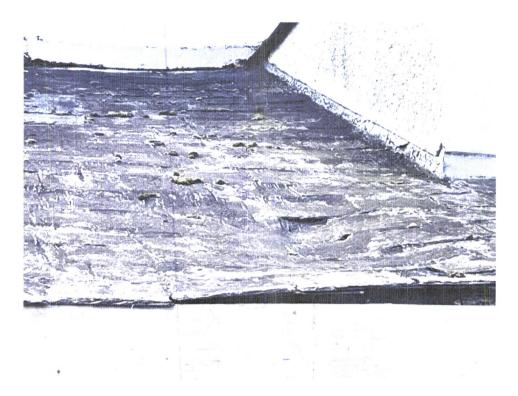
Sagging roof slope with damaged slates. Bitumen coating to the slates.
